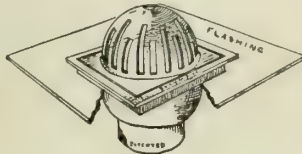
DRAIN FOR CONCRETE ROOFS WITH BEEHIVE
